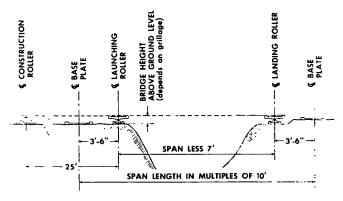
Sketch af proposed loyout of a panel bridge.
